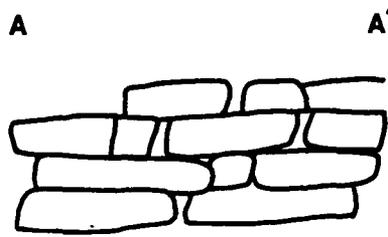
Site NM-Q-22-51, Plan View of Western Ends of Two Exposed Wall Segments.
